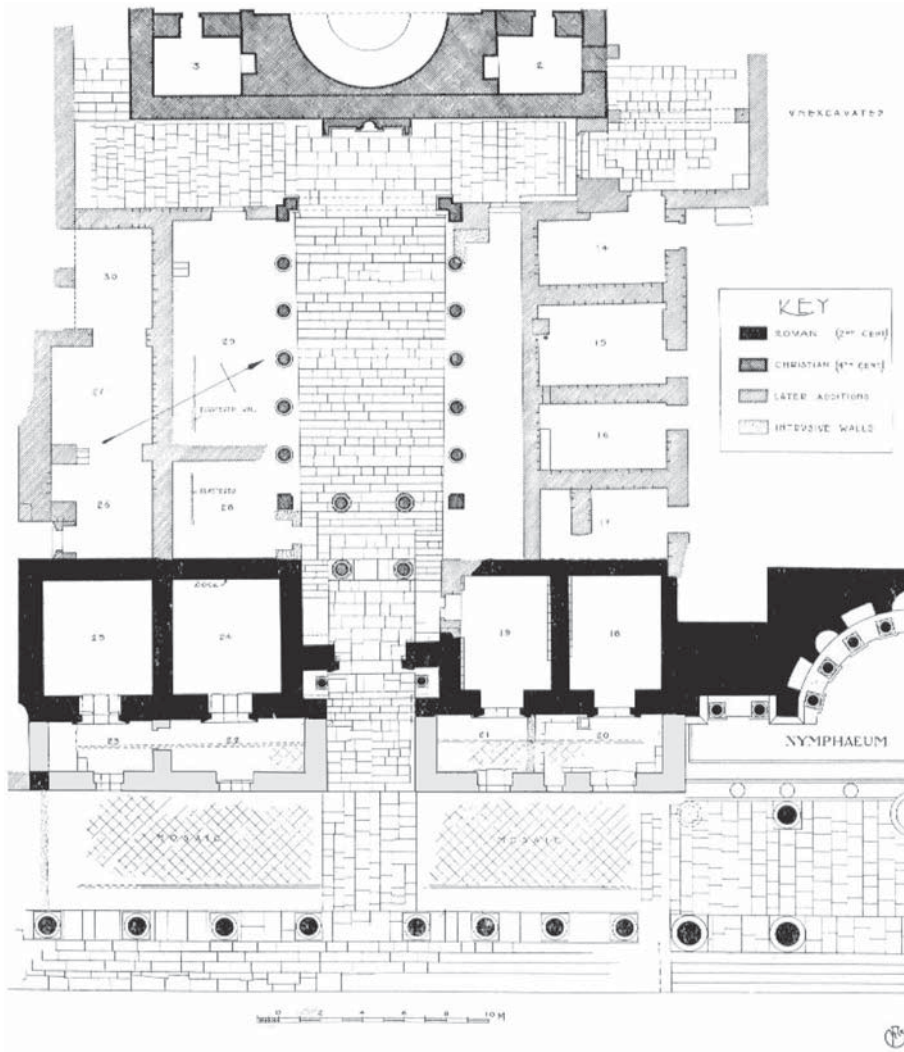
The shops on both sides of the staircase leading to the Church of Theodore at Gerasa (adapted from Kraeling 1938, plan 29).
